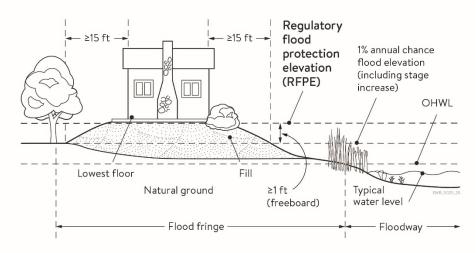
C-3: Overview of fill standards for residential structures.
